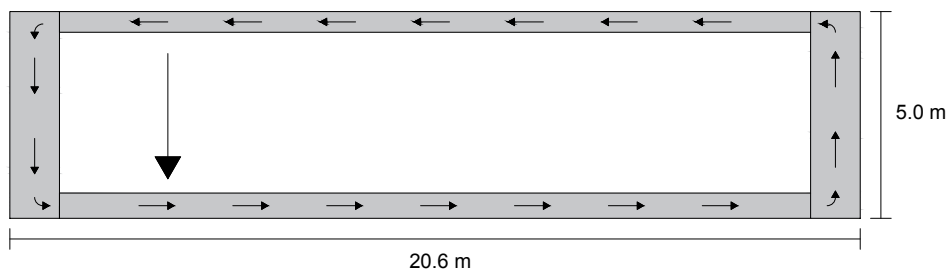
Shear loading from torsion in an indicated closed section formed by floor girders, side girders and top connections
